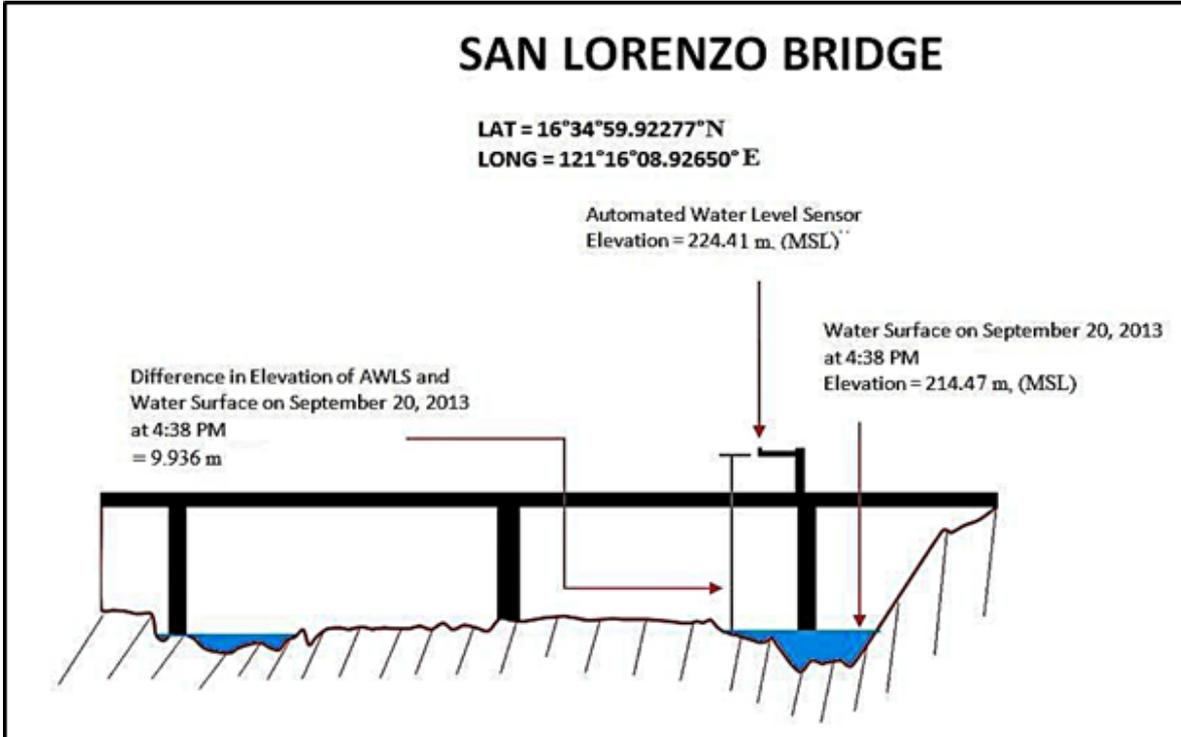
San Lorenzo Bridge Cross-Section Diagram
